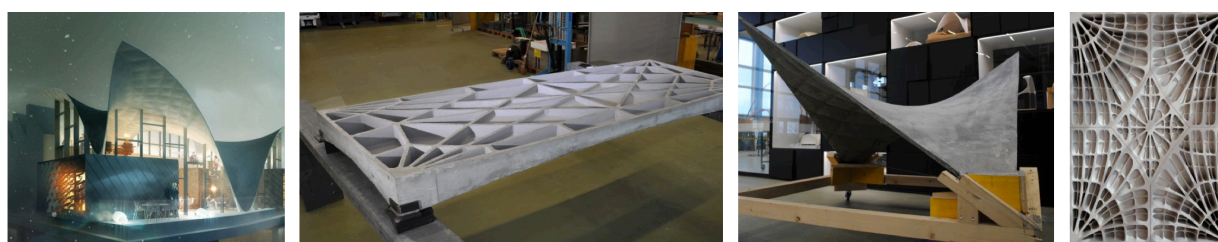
NEST HiLo in Dübendorf, Switzerland: a) building, b) floor system, c) roof shell, [9] d) digital fabrication [8]
